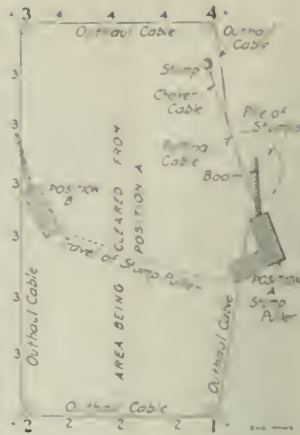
WORKING ARRANGEMENT IN CLEARING LAND BY MACHINE
